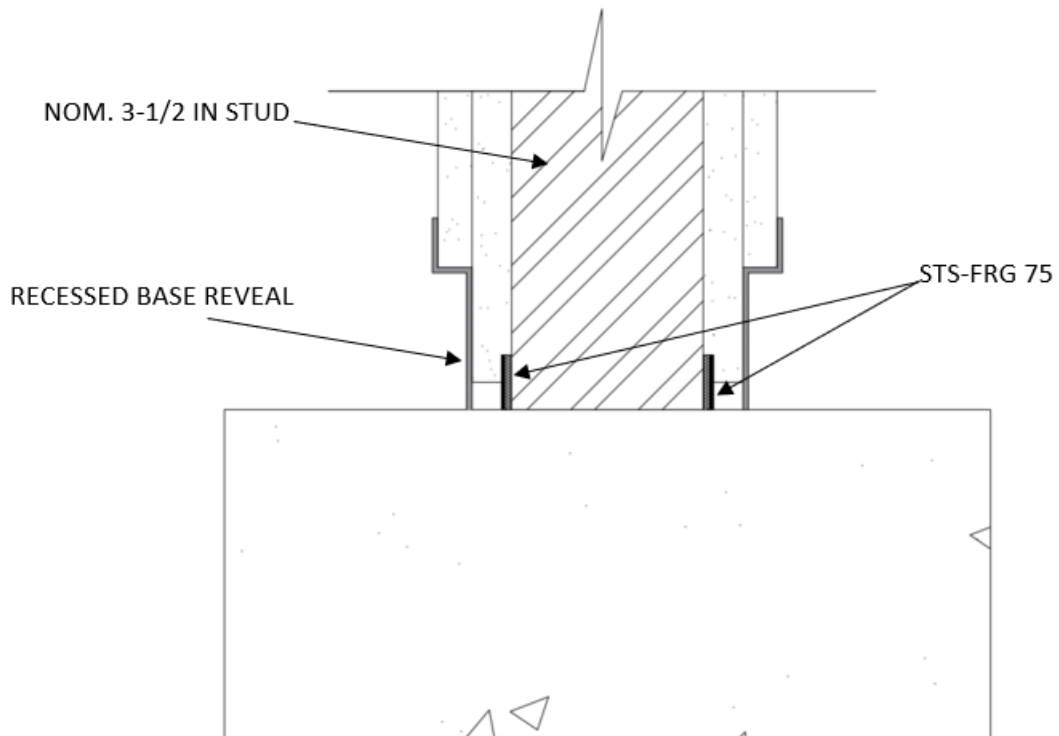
CAD rendering of bottom of wall joint showing the STS-FRG 75 installed on both legs of floor runner behind the steel recessed reveals.
